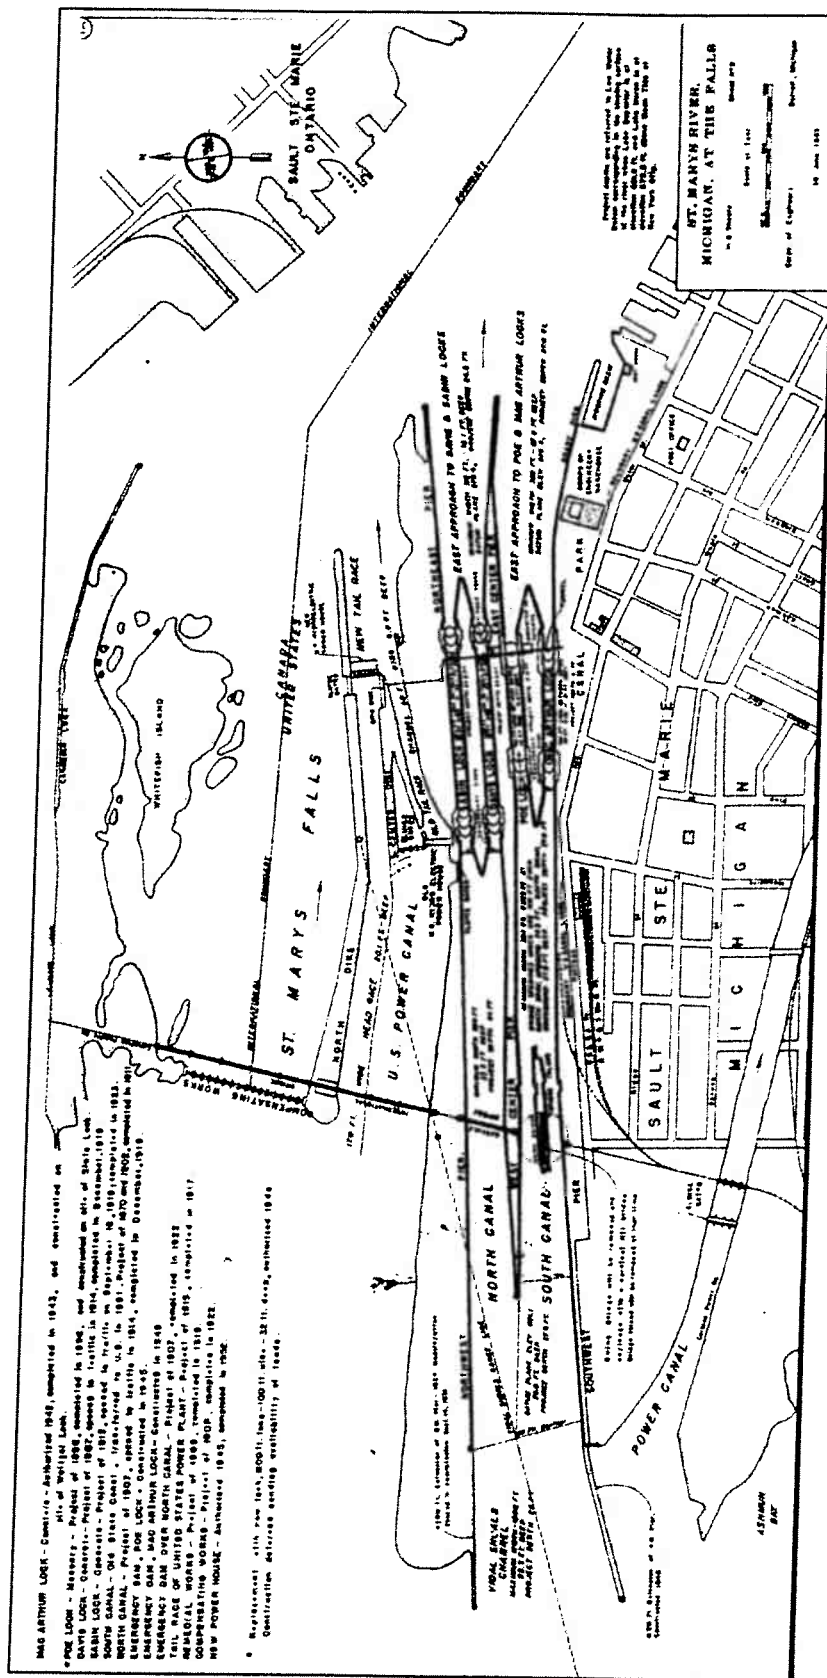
Site plan of St. Marys Falls Canal System, c. 1955 (adapted from U.S. Army Corps of Engineers, Detroit District brochure, "St. Marys Falls Canal," c.1955).
